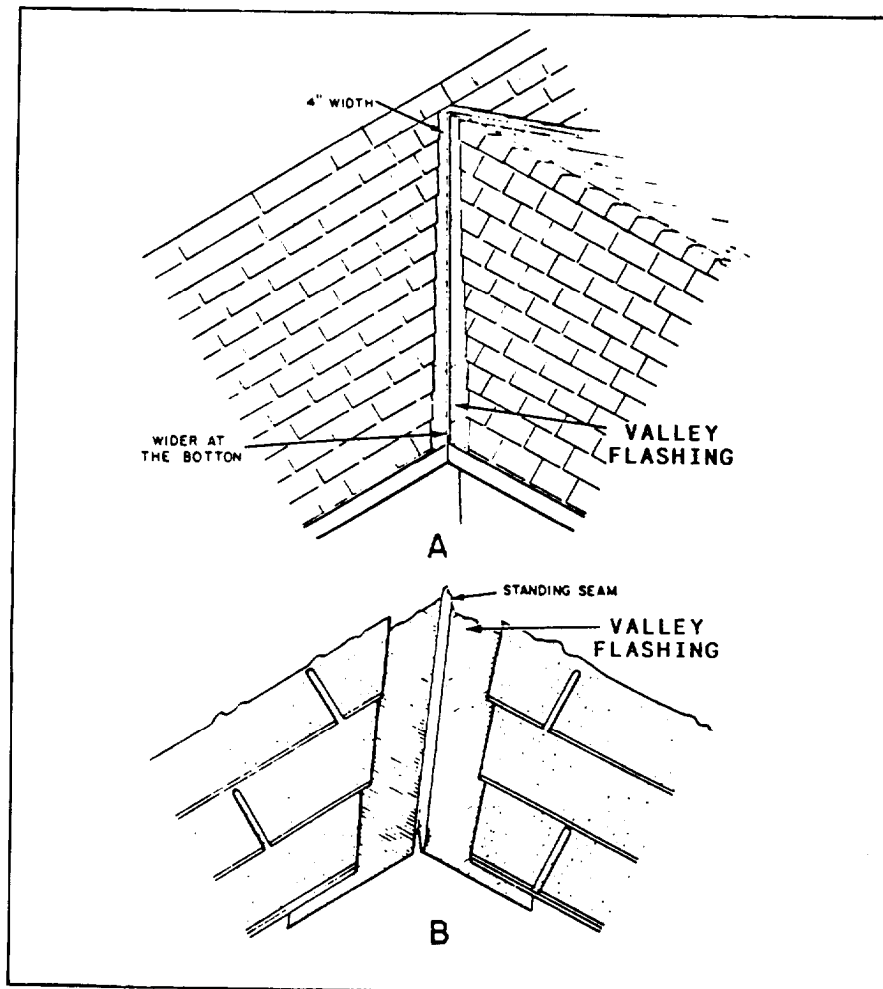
Valley flashing: A. Valley; B. Standing seam.
